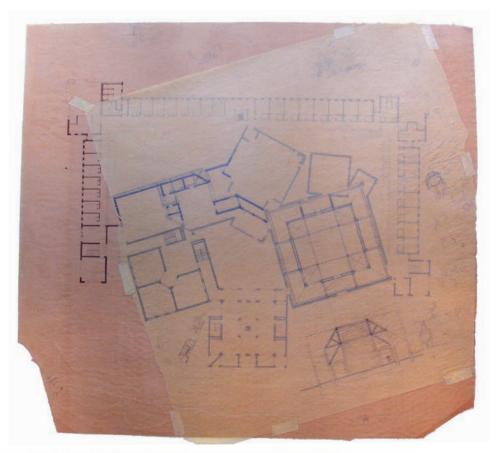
Plan, ca. May 1968 (note Roof Truss)
